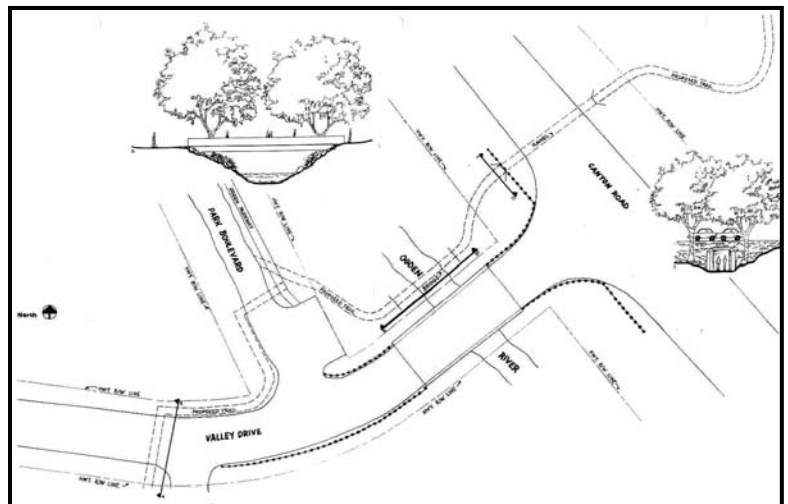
Schematic of tunnel crossing and connection of the Bonneville Shoreline trail under the street.
